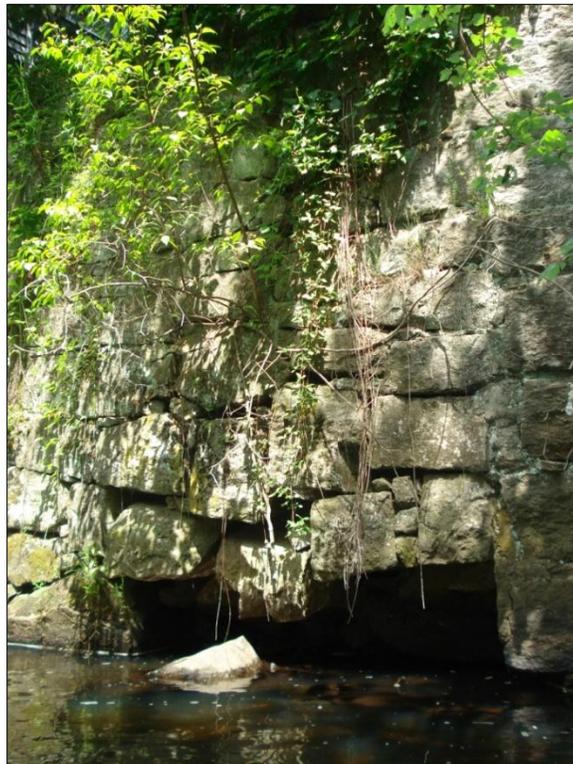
Looking Northeast: Crumbling of Wall Above Void in Northeast Training Wall
